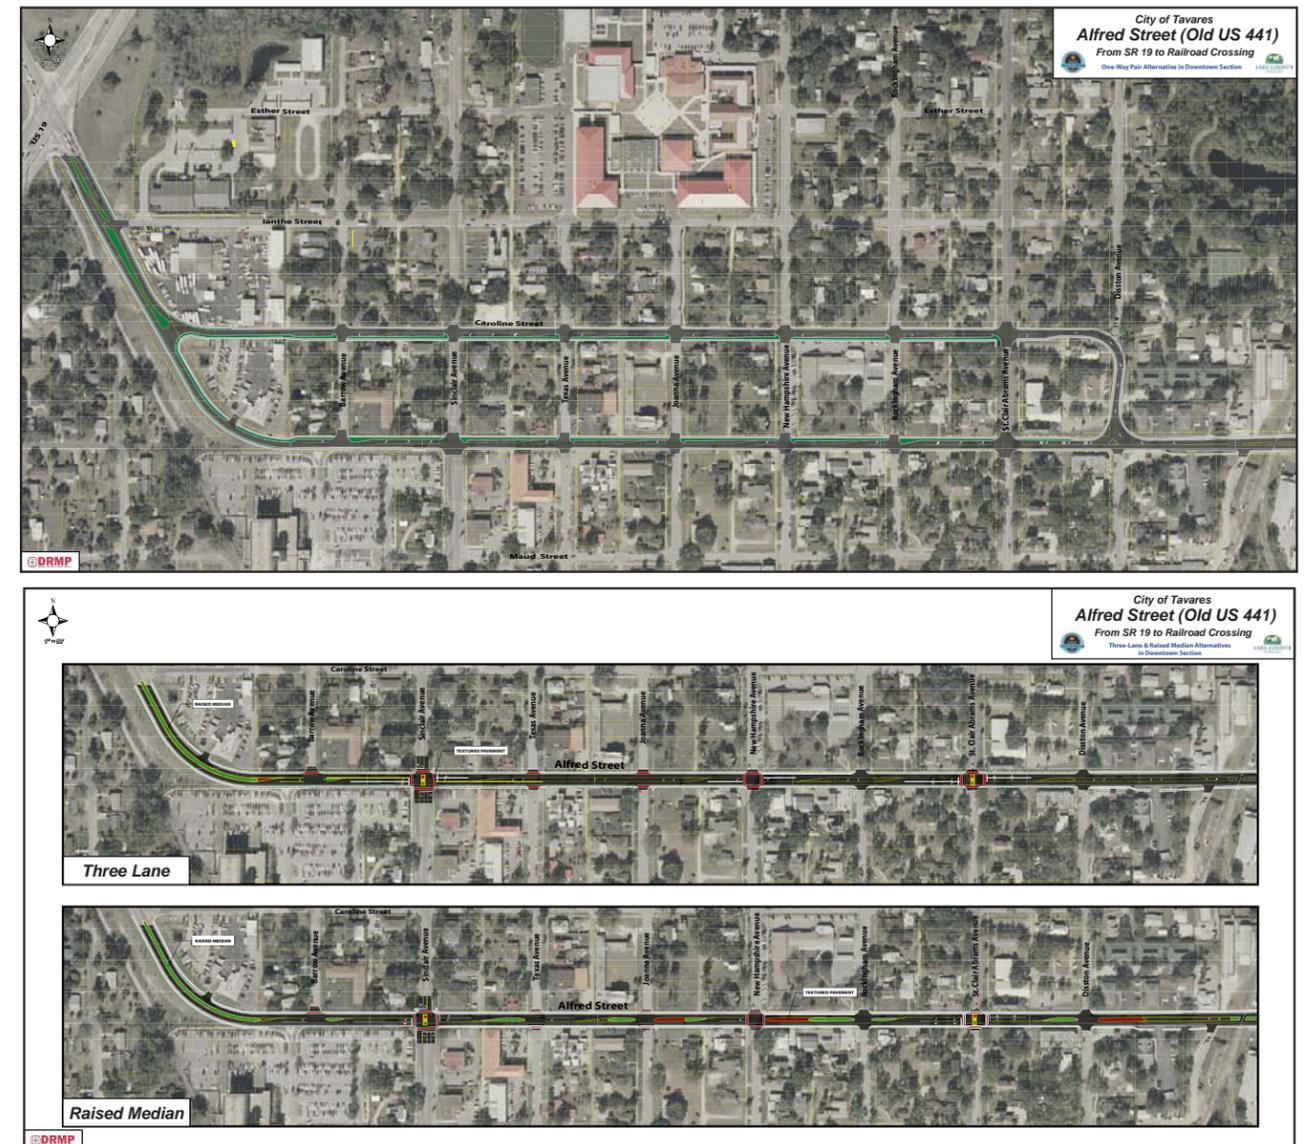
Alfred Street Corridor Study, Proposed Alternatives Downtown Tavares CRA
